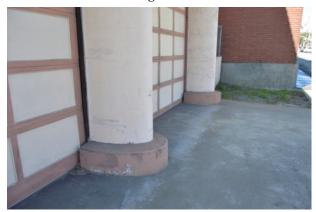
Concrete columns and concrete wheel guards at apparatus bays.
